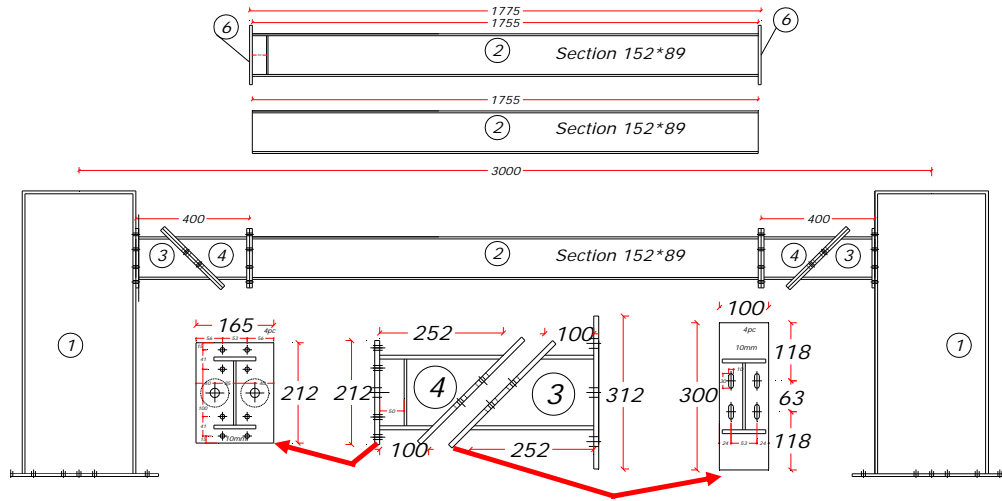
Geometrical details of the Steel Beam with Slant End-plate Connection for Experimental Study (Full-scale Specimen). All Units are in mm
